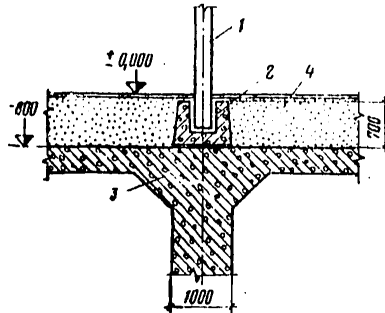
Schematic of above-ground frame resting on shelter's overhead cover through a sleeve foundation
